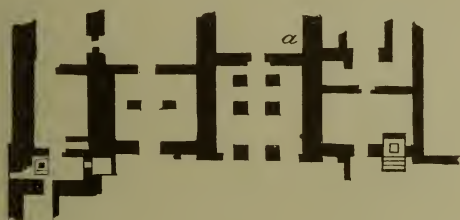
PORTION OF GROUND-PLAN OF BUILDING UNCOVERED BY CHARNAY.
